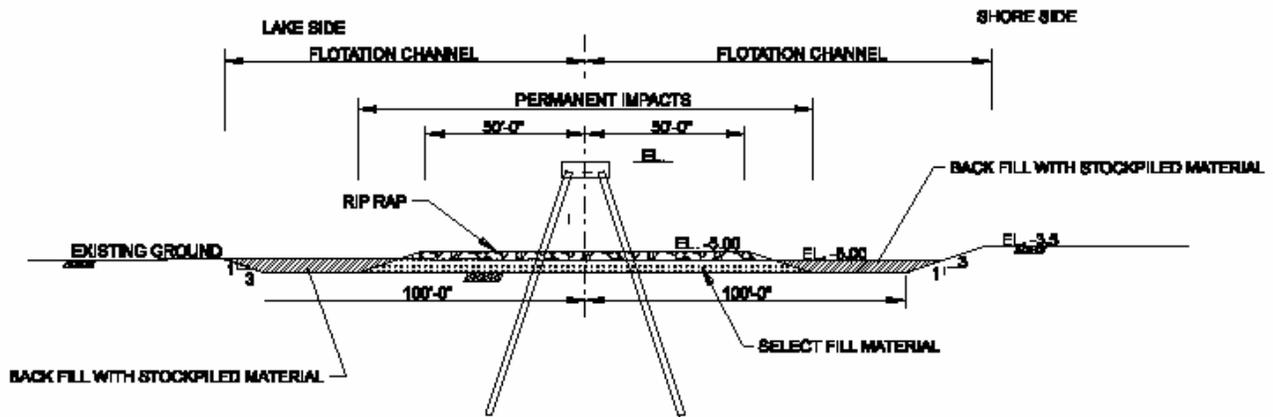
Typical Breakwater Modification (existing conditions at breakwaters #2 and #3 not shown) (Suburban and Elmwood)
